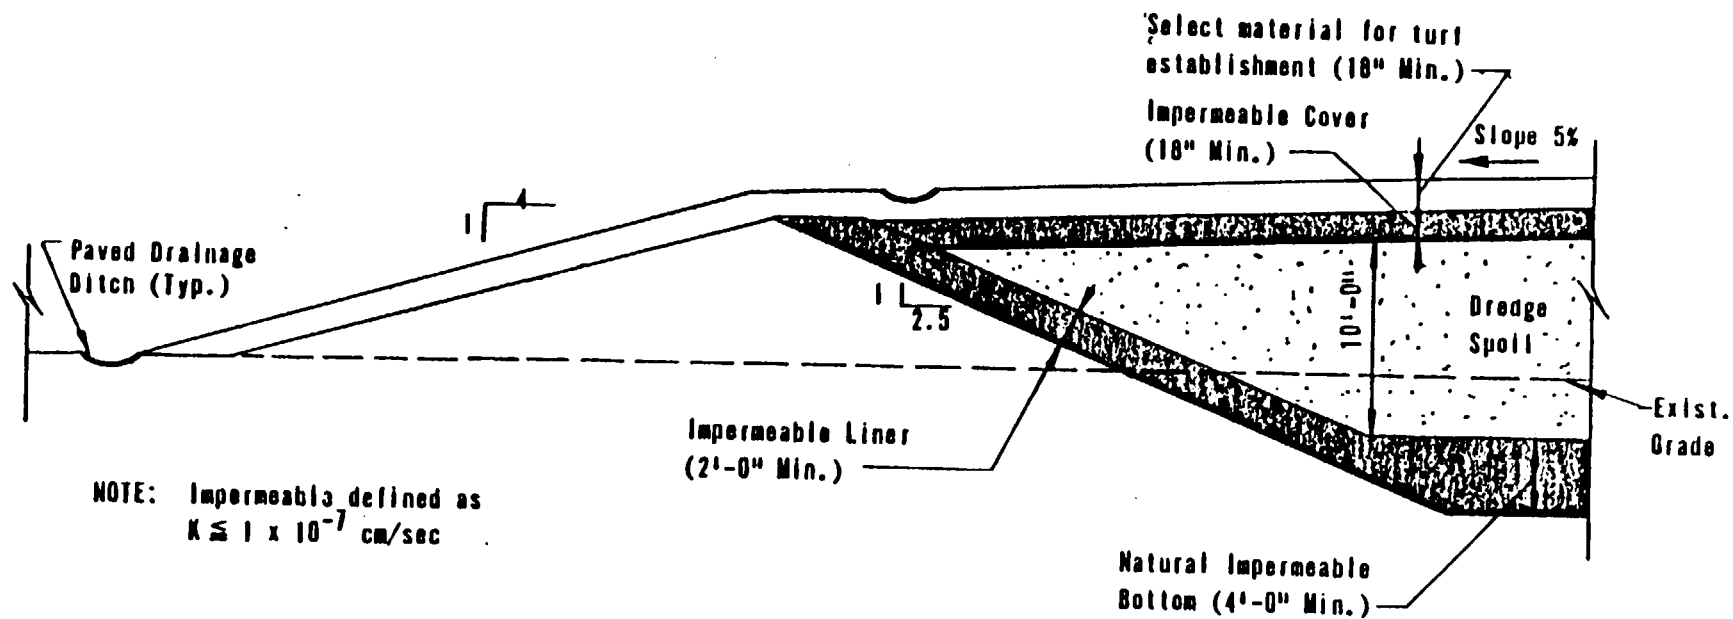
shows a sketch of a typical disposal site for hydraulic dredging systems. Features of such a site would include:
